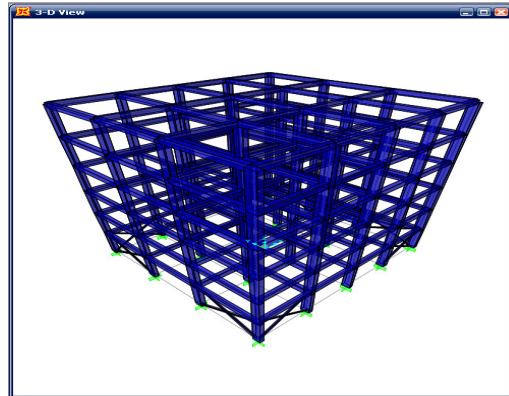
Modelling of Updated Building Case-1 Steel Bracing ^[06]
